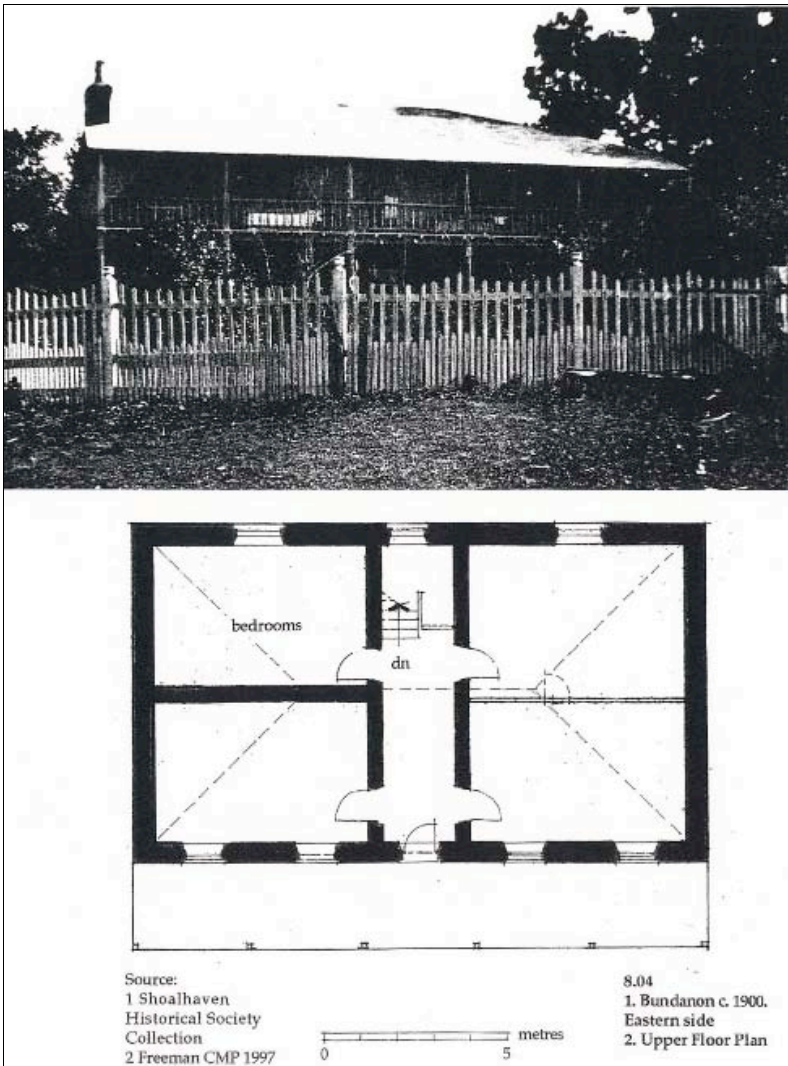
APPENDIX 1 • Bundanon first floor plan c1900 • Source: SHSC and PF/PL in Hobbs op cit.
